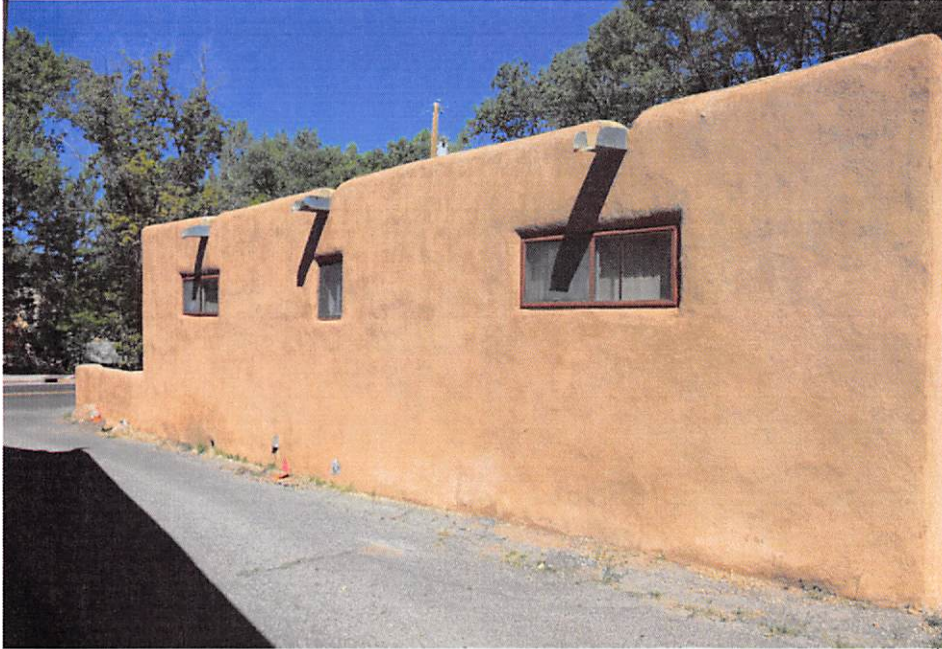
East elevation with aluminum glider windows and metal canales. Asphalt driveway is evident in foreground.
